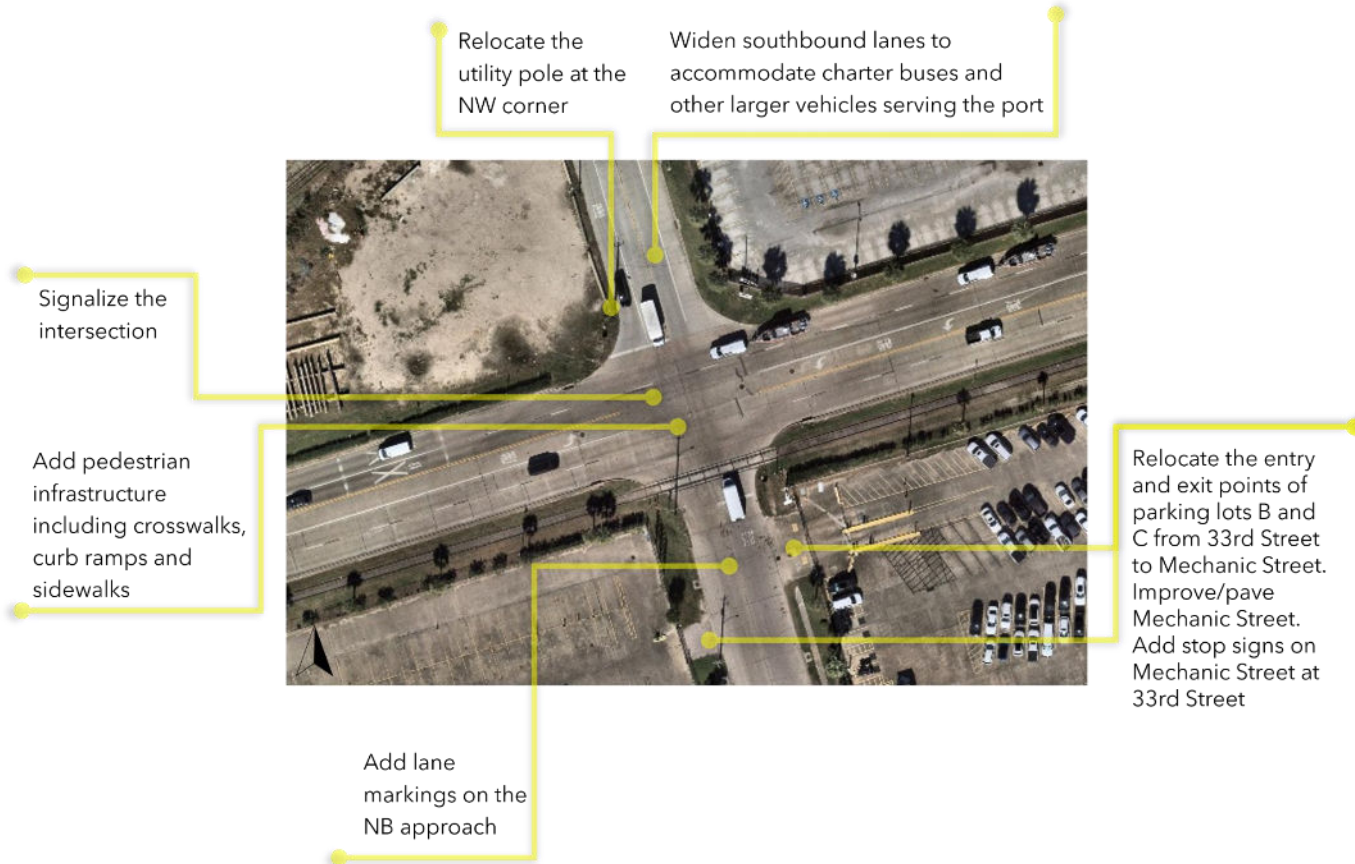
Recommended Improvements to the Intersection of Harborside Drive at 33<sup>rd</sup> Street
